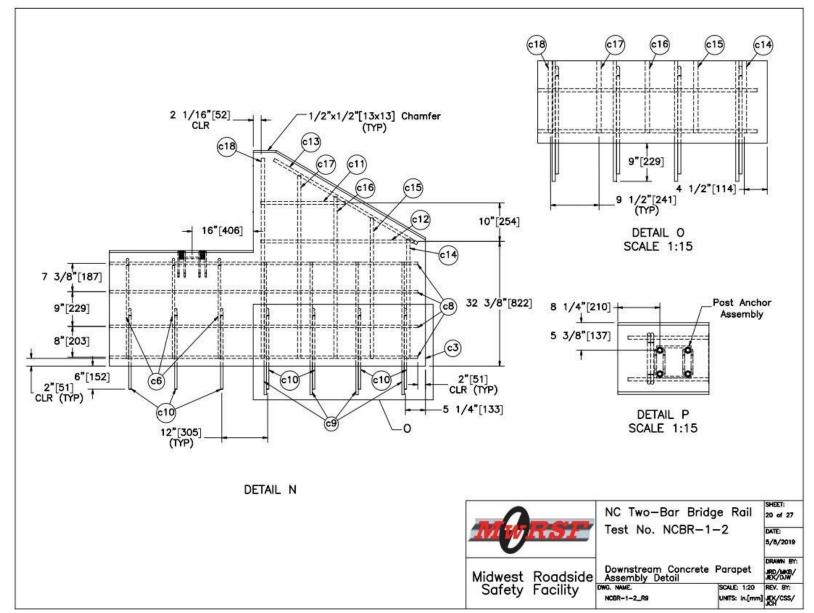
Downstream Concrete Parapet Assembly, Test Nos. NCBR-1 and NCBR-2
